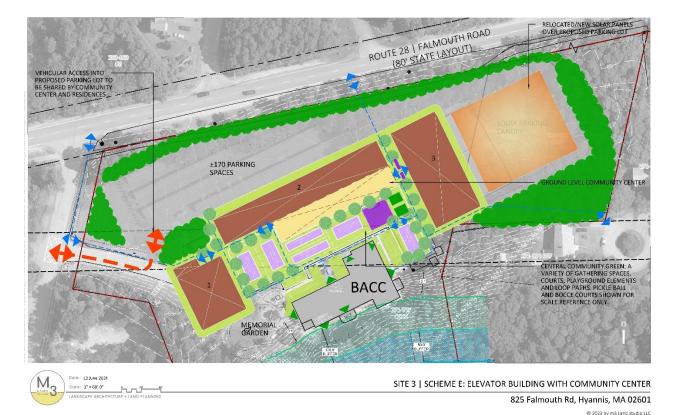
Site 3 | Scheme E. See Appendix for 11x17 scaled plan drawing.
